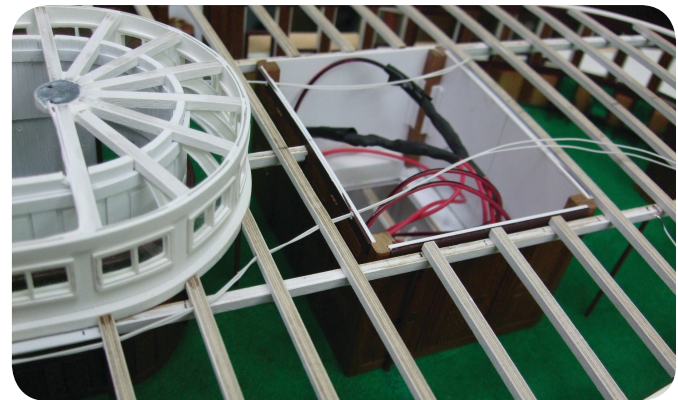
Angle irons have been added to the longitudinal beam to provide a surface on which the joists can rest.
